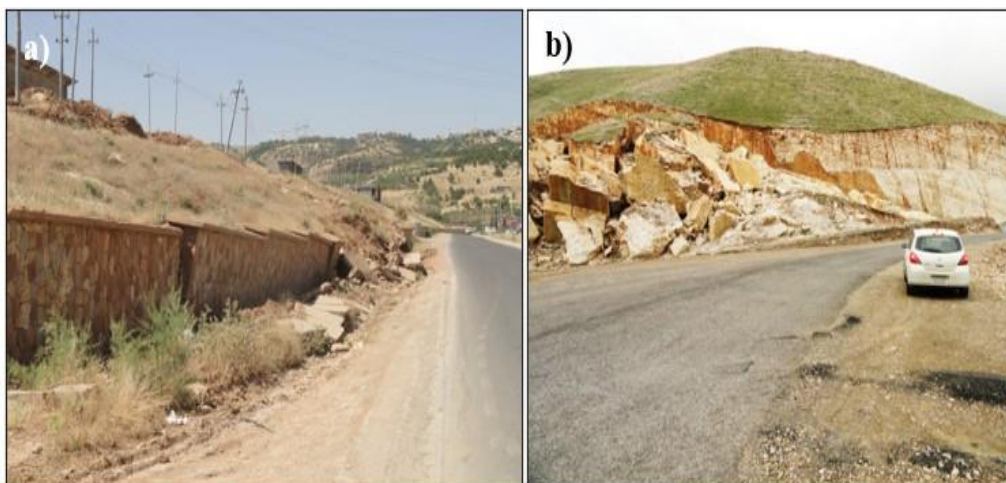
a) Small-sized failure near Kori village caused the failure of the protection wall, b) Large-sized failure east of Dokan Lake, caused changing the road route (the original route is under the blocks).
